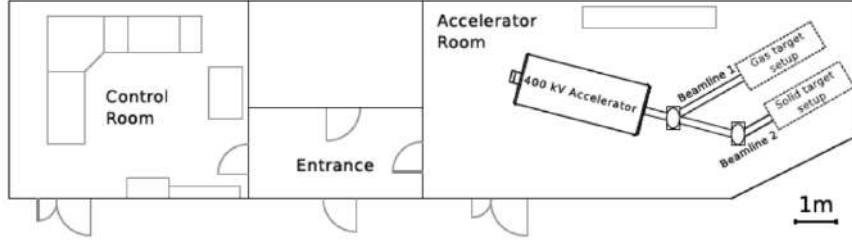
Sketch of the floor plan of the LUNA facility underground at LNGS [38].
